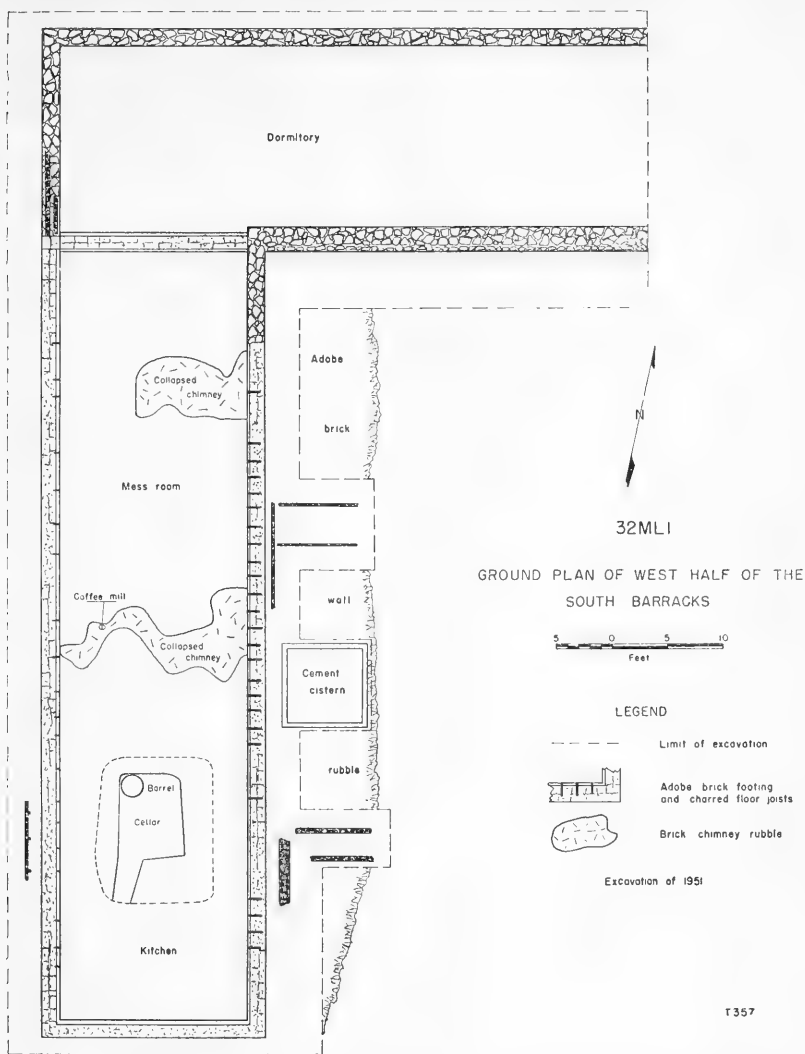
Ground plan of the site of the west half of the South Barracks, Fort Stevenson, showing excavations of 1951.
